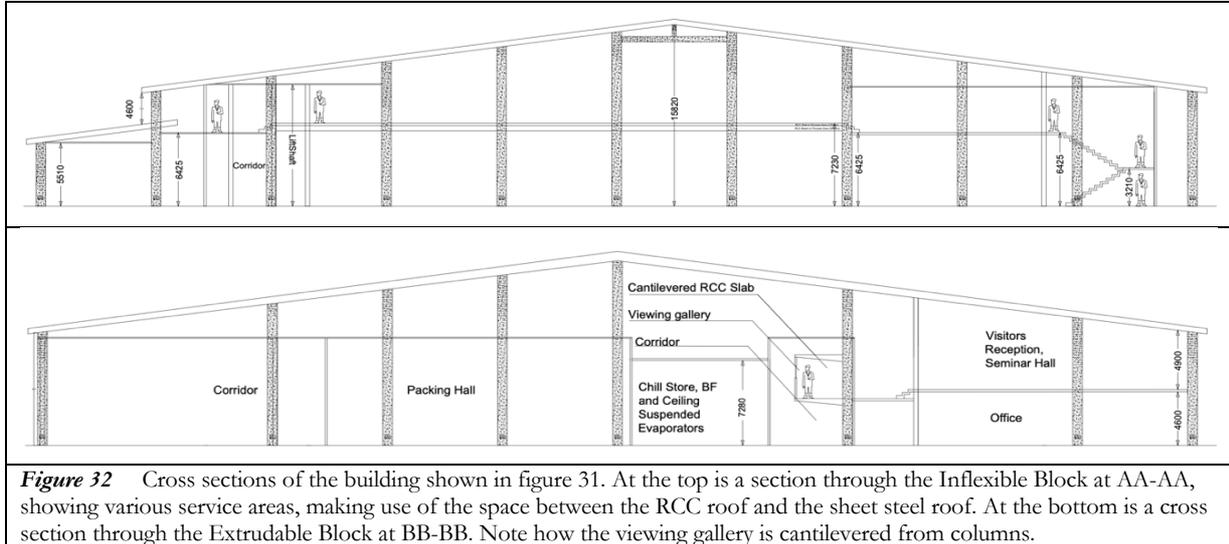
Cross sections of the building shown in figure 31. At the top is a section through the Inflexible Block at AA-AA, showing various service areas, making use of the space between the RCC roof and the sheet steel roof. At the bottom is a cross section through the Extrudable Block at BB-BB. Note how the viewing gallery is cantilevered from columns.
